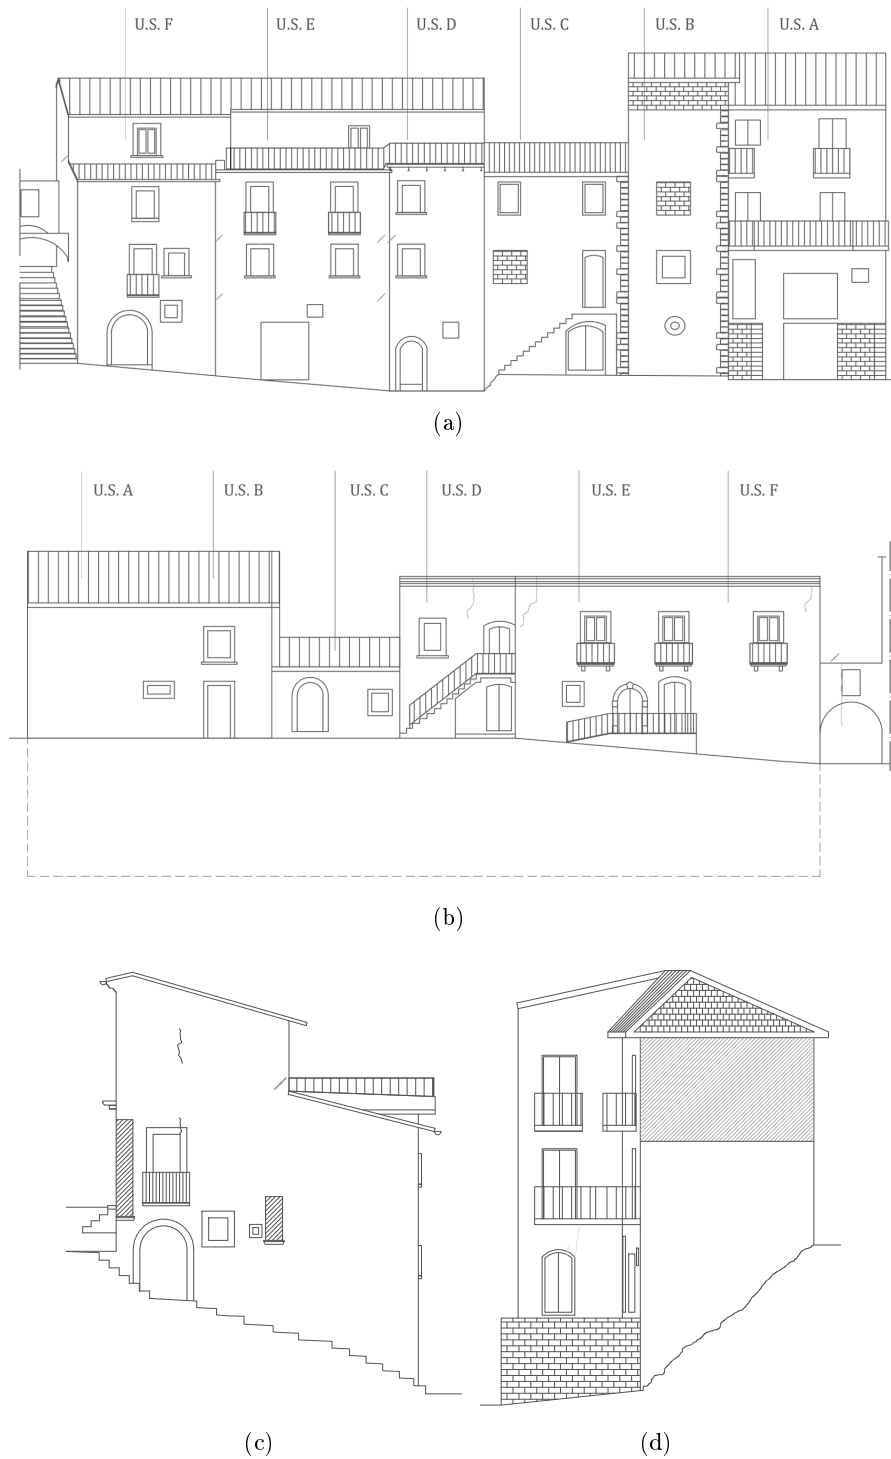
Building aggregate elevations given by *Scheda di Aggregato* [Scheda di Aggregato 2010]. (a) South façade. (b) North façade. (c) West side elevation. (d) East side elevation.
